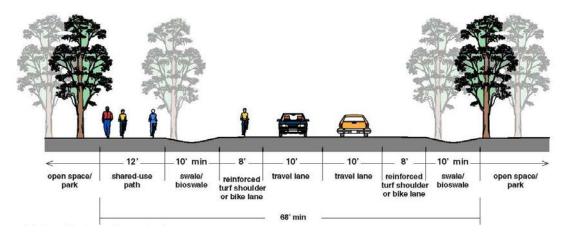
Sample Rural Boulevard Street Section with Separated Shared Use Path.
